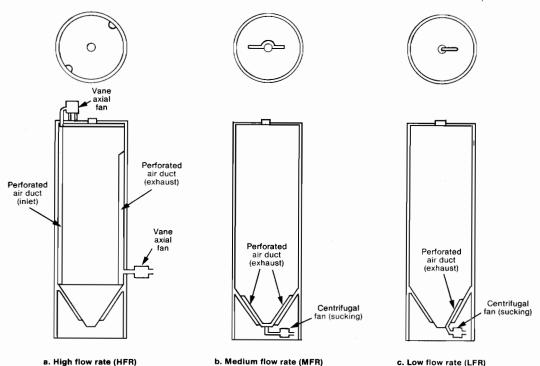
Plan and elevation of tower silo experimental aeration systems at Ulu Tiram Buruk, Malaysia.
